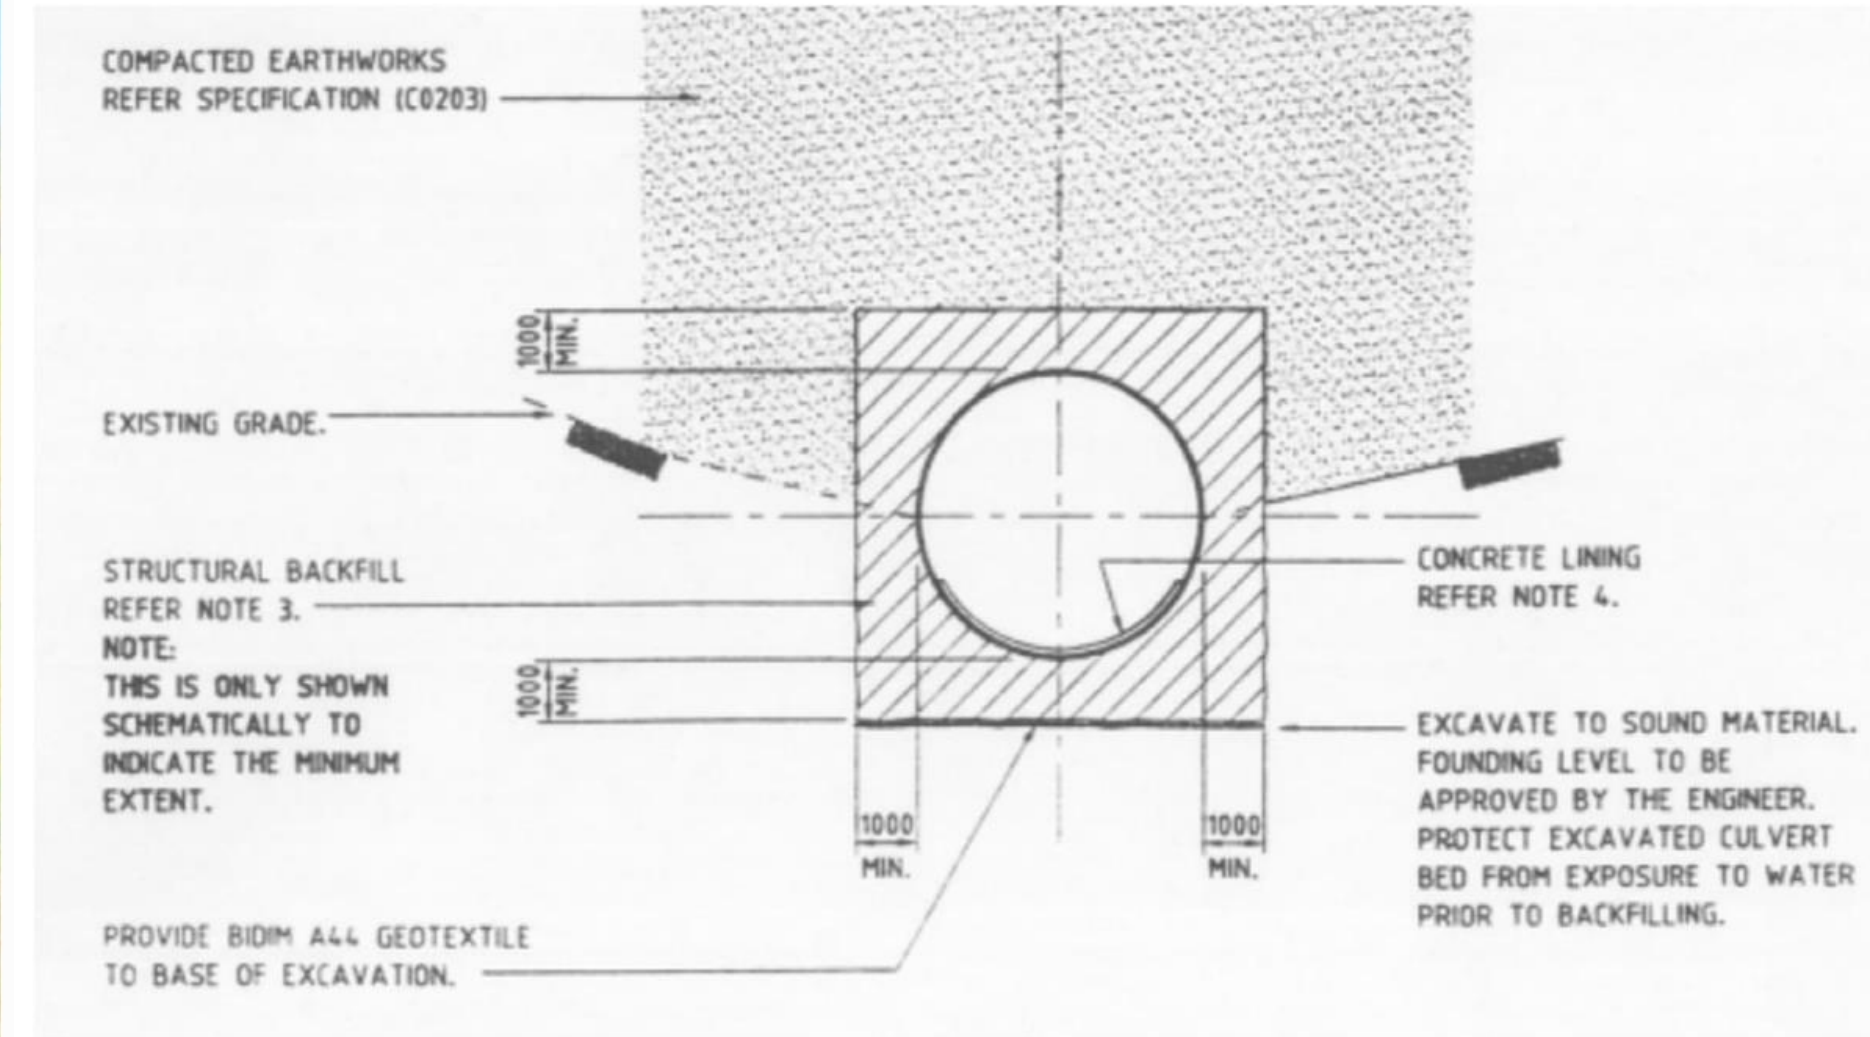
Culvert Asbuilt Construction Drawing (1998, from ASM).
